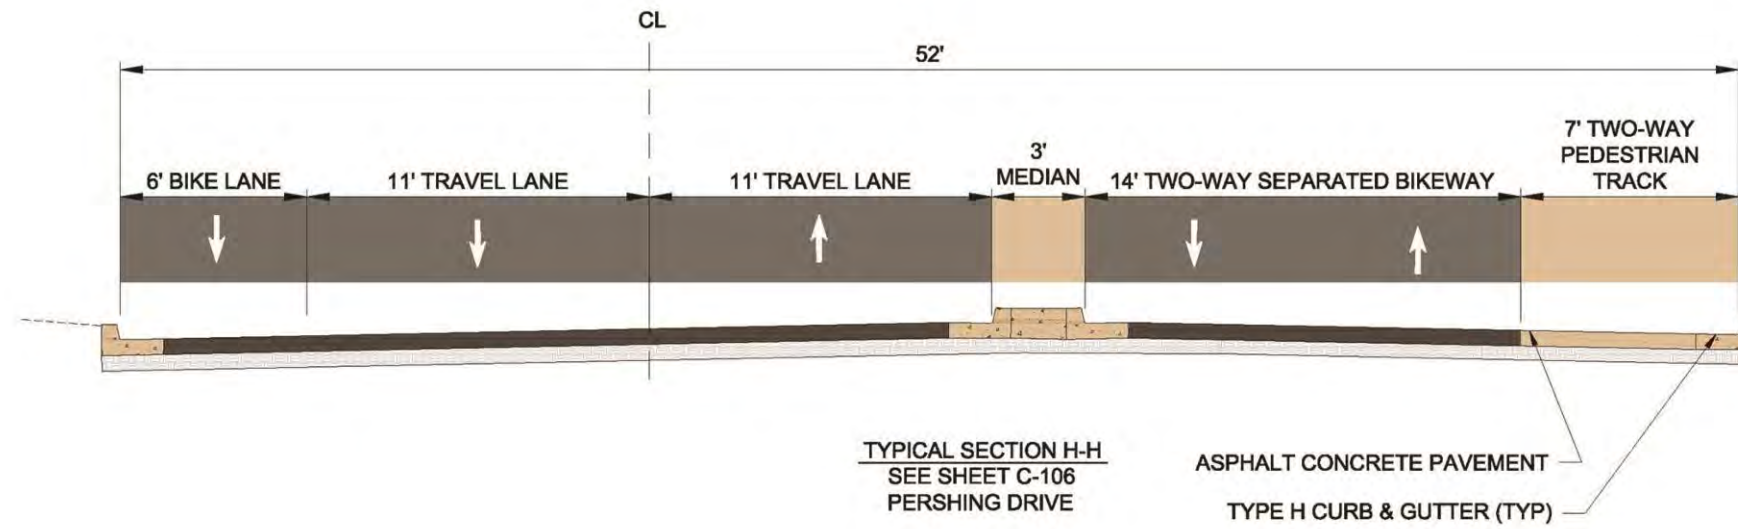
Typical Cross Section on Pershing Drive between Redwood and Upas Streets (NB)
